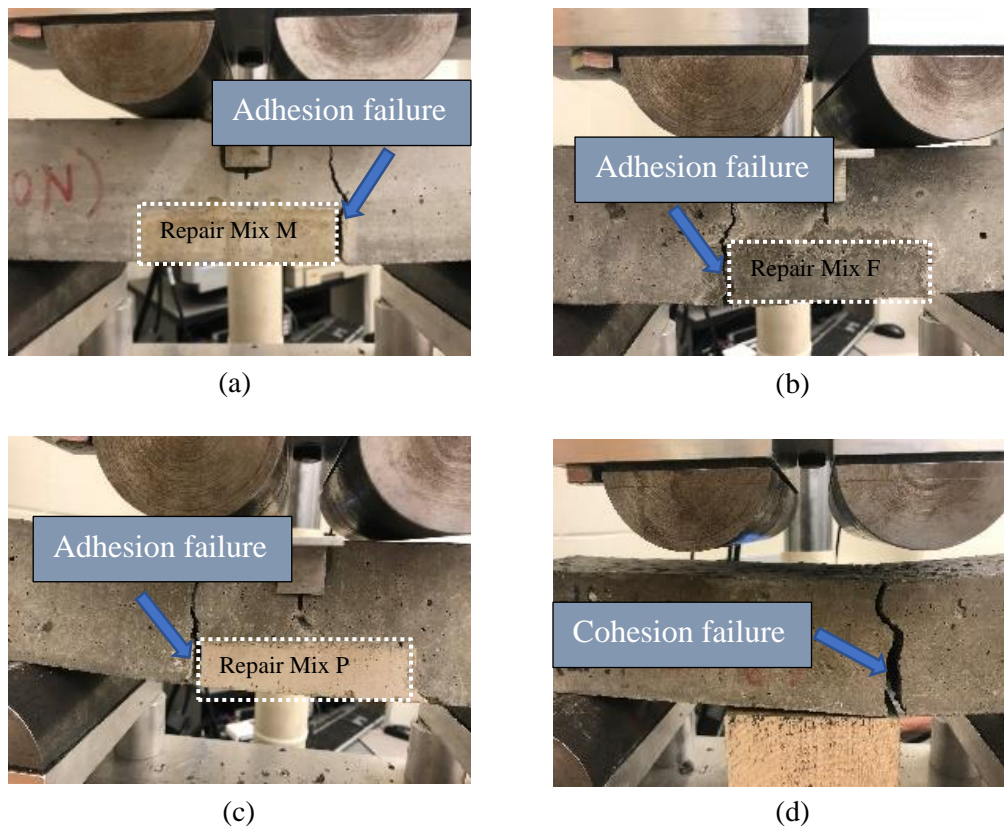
Failure mode under cyclic loading of (a) Mix M repaired specimen (b) Mix F repaired specimen (c) Mix P repaired specimen (d) Control Mix S specimen
